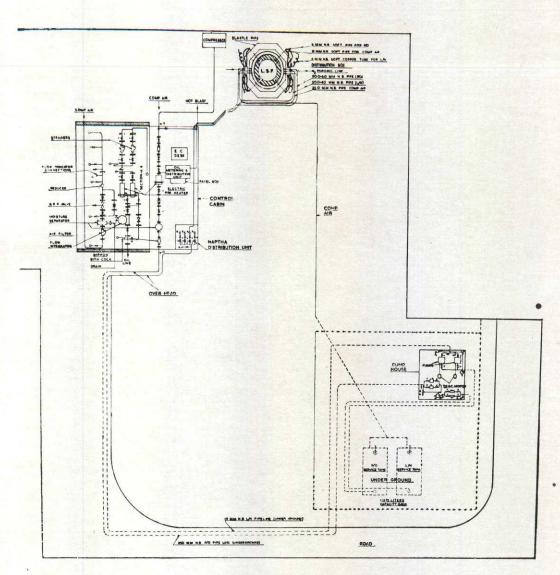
Schematic Layout of the Fuel Oil/Naphtha Injection System
